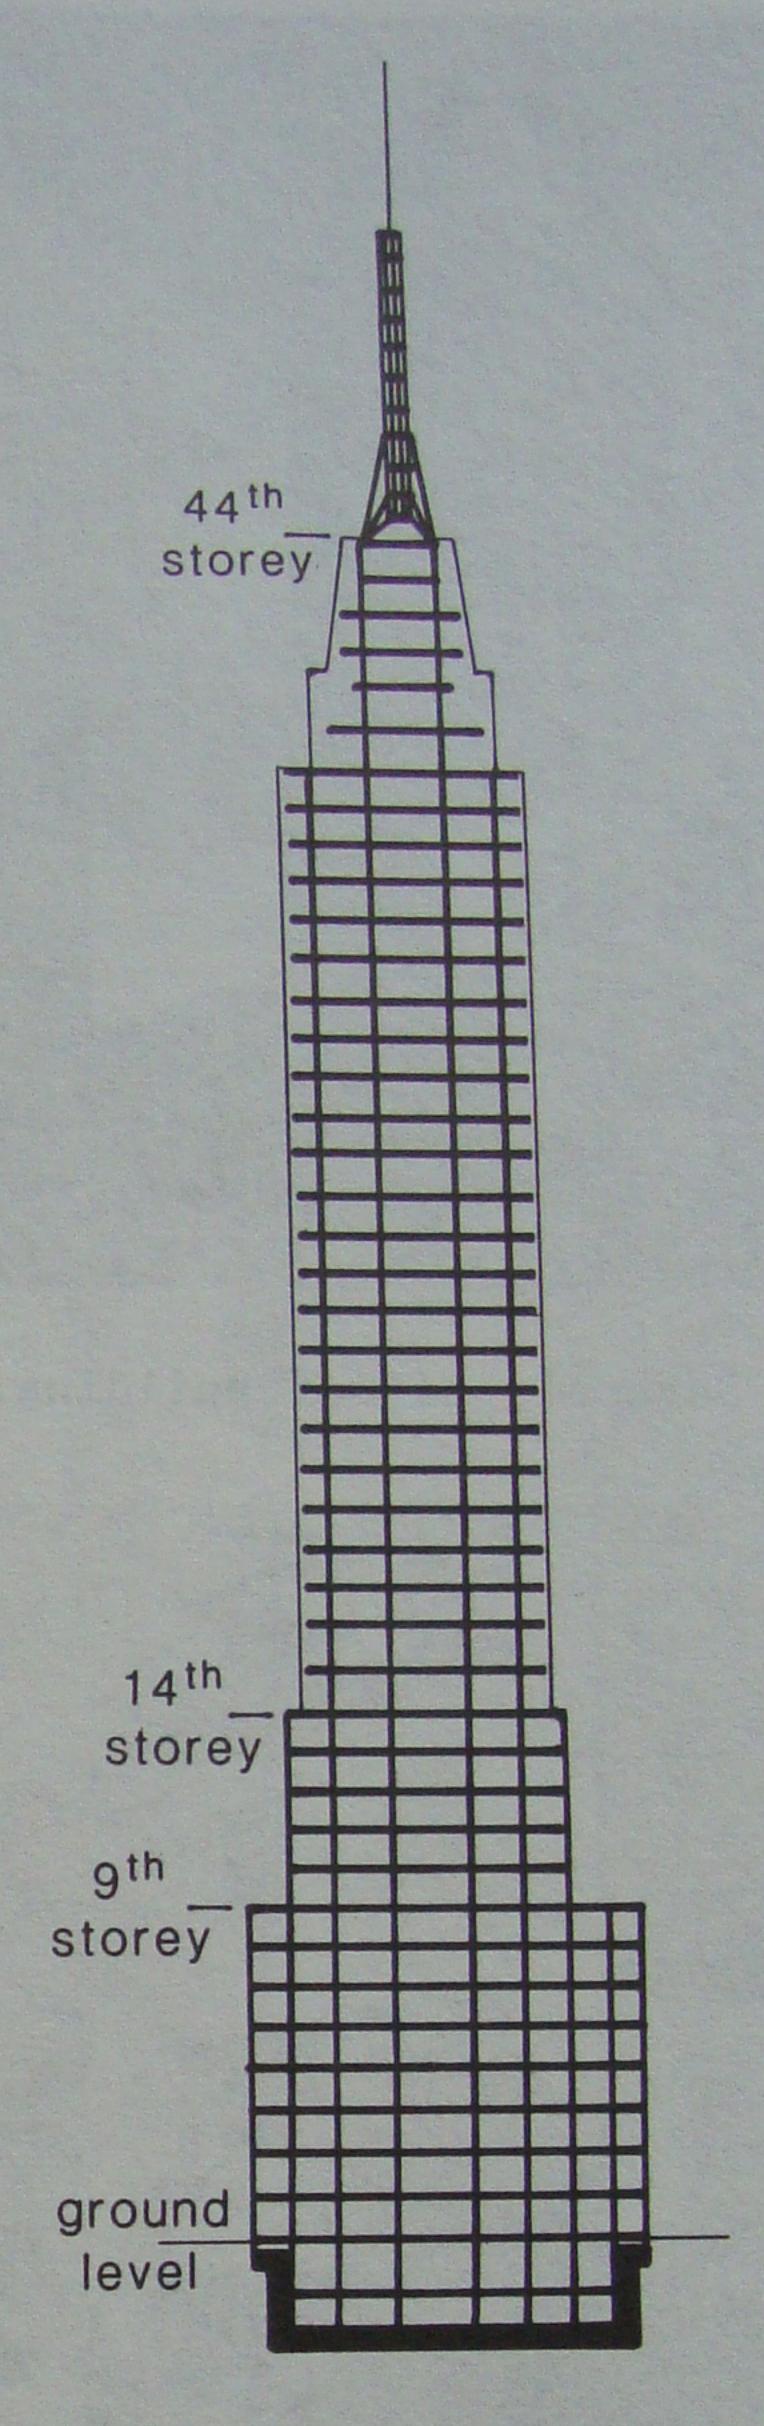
Structural steel framing of the 44 storey Latin American Tower (adapted from Zeevaert and Cuevas 1983).
